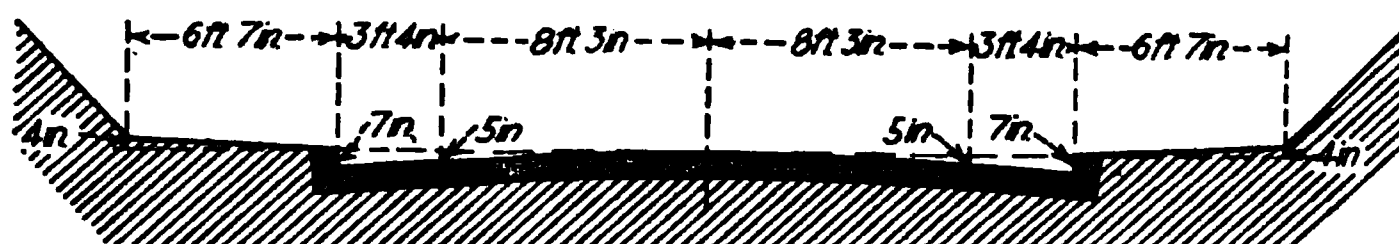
TYPICAL ROAD IN DEPARTMENT OF SEINE-ET OISE, FRANCE.
